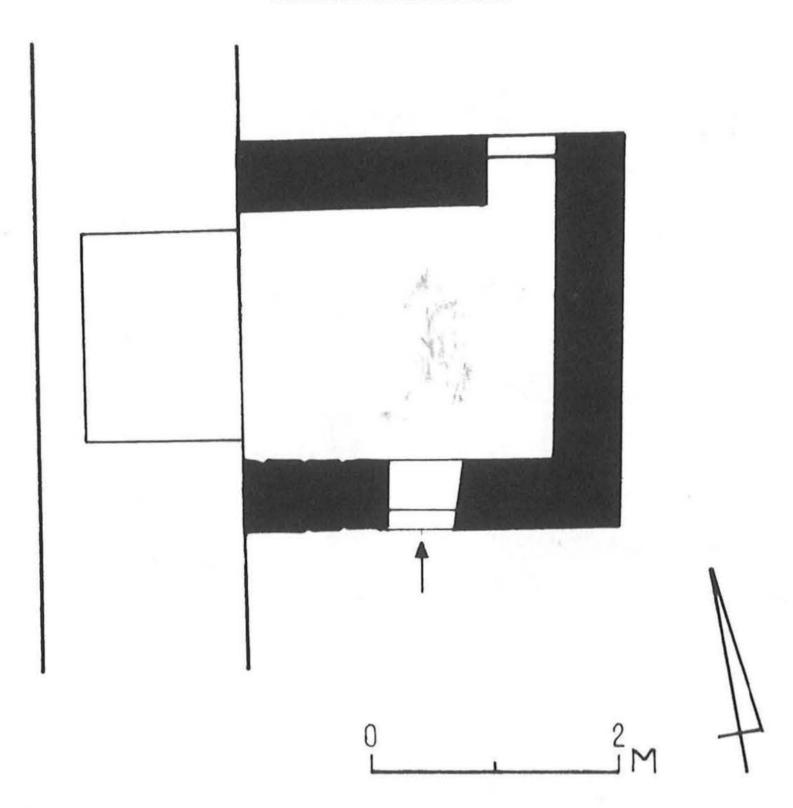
Plan of Cell 2 (after Masada III, Plan 6).
